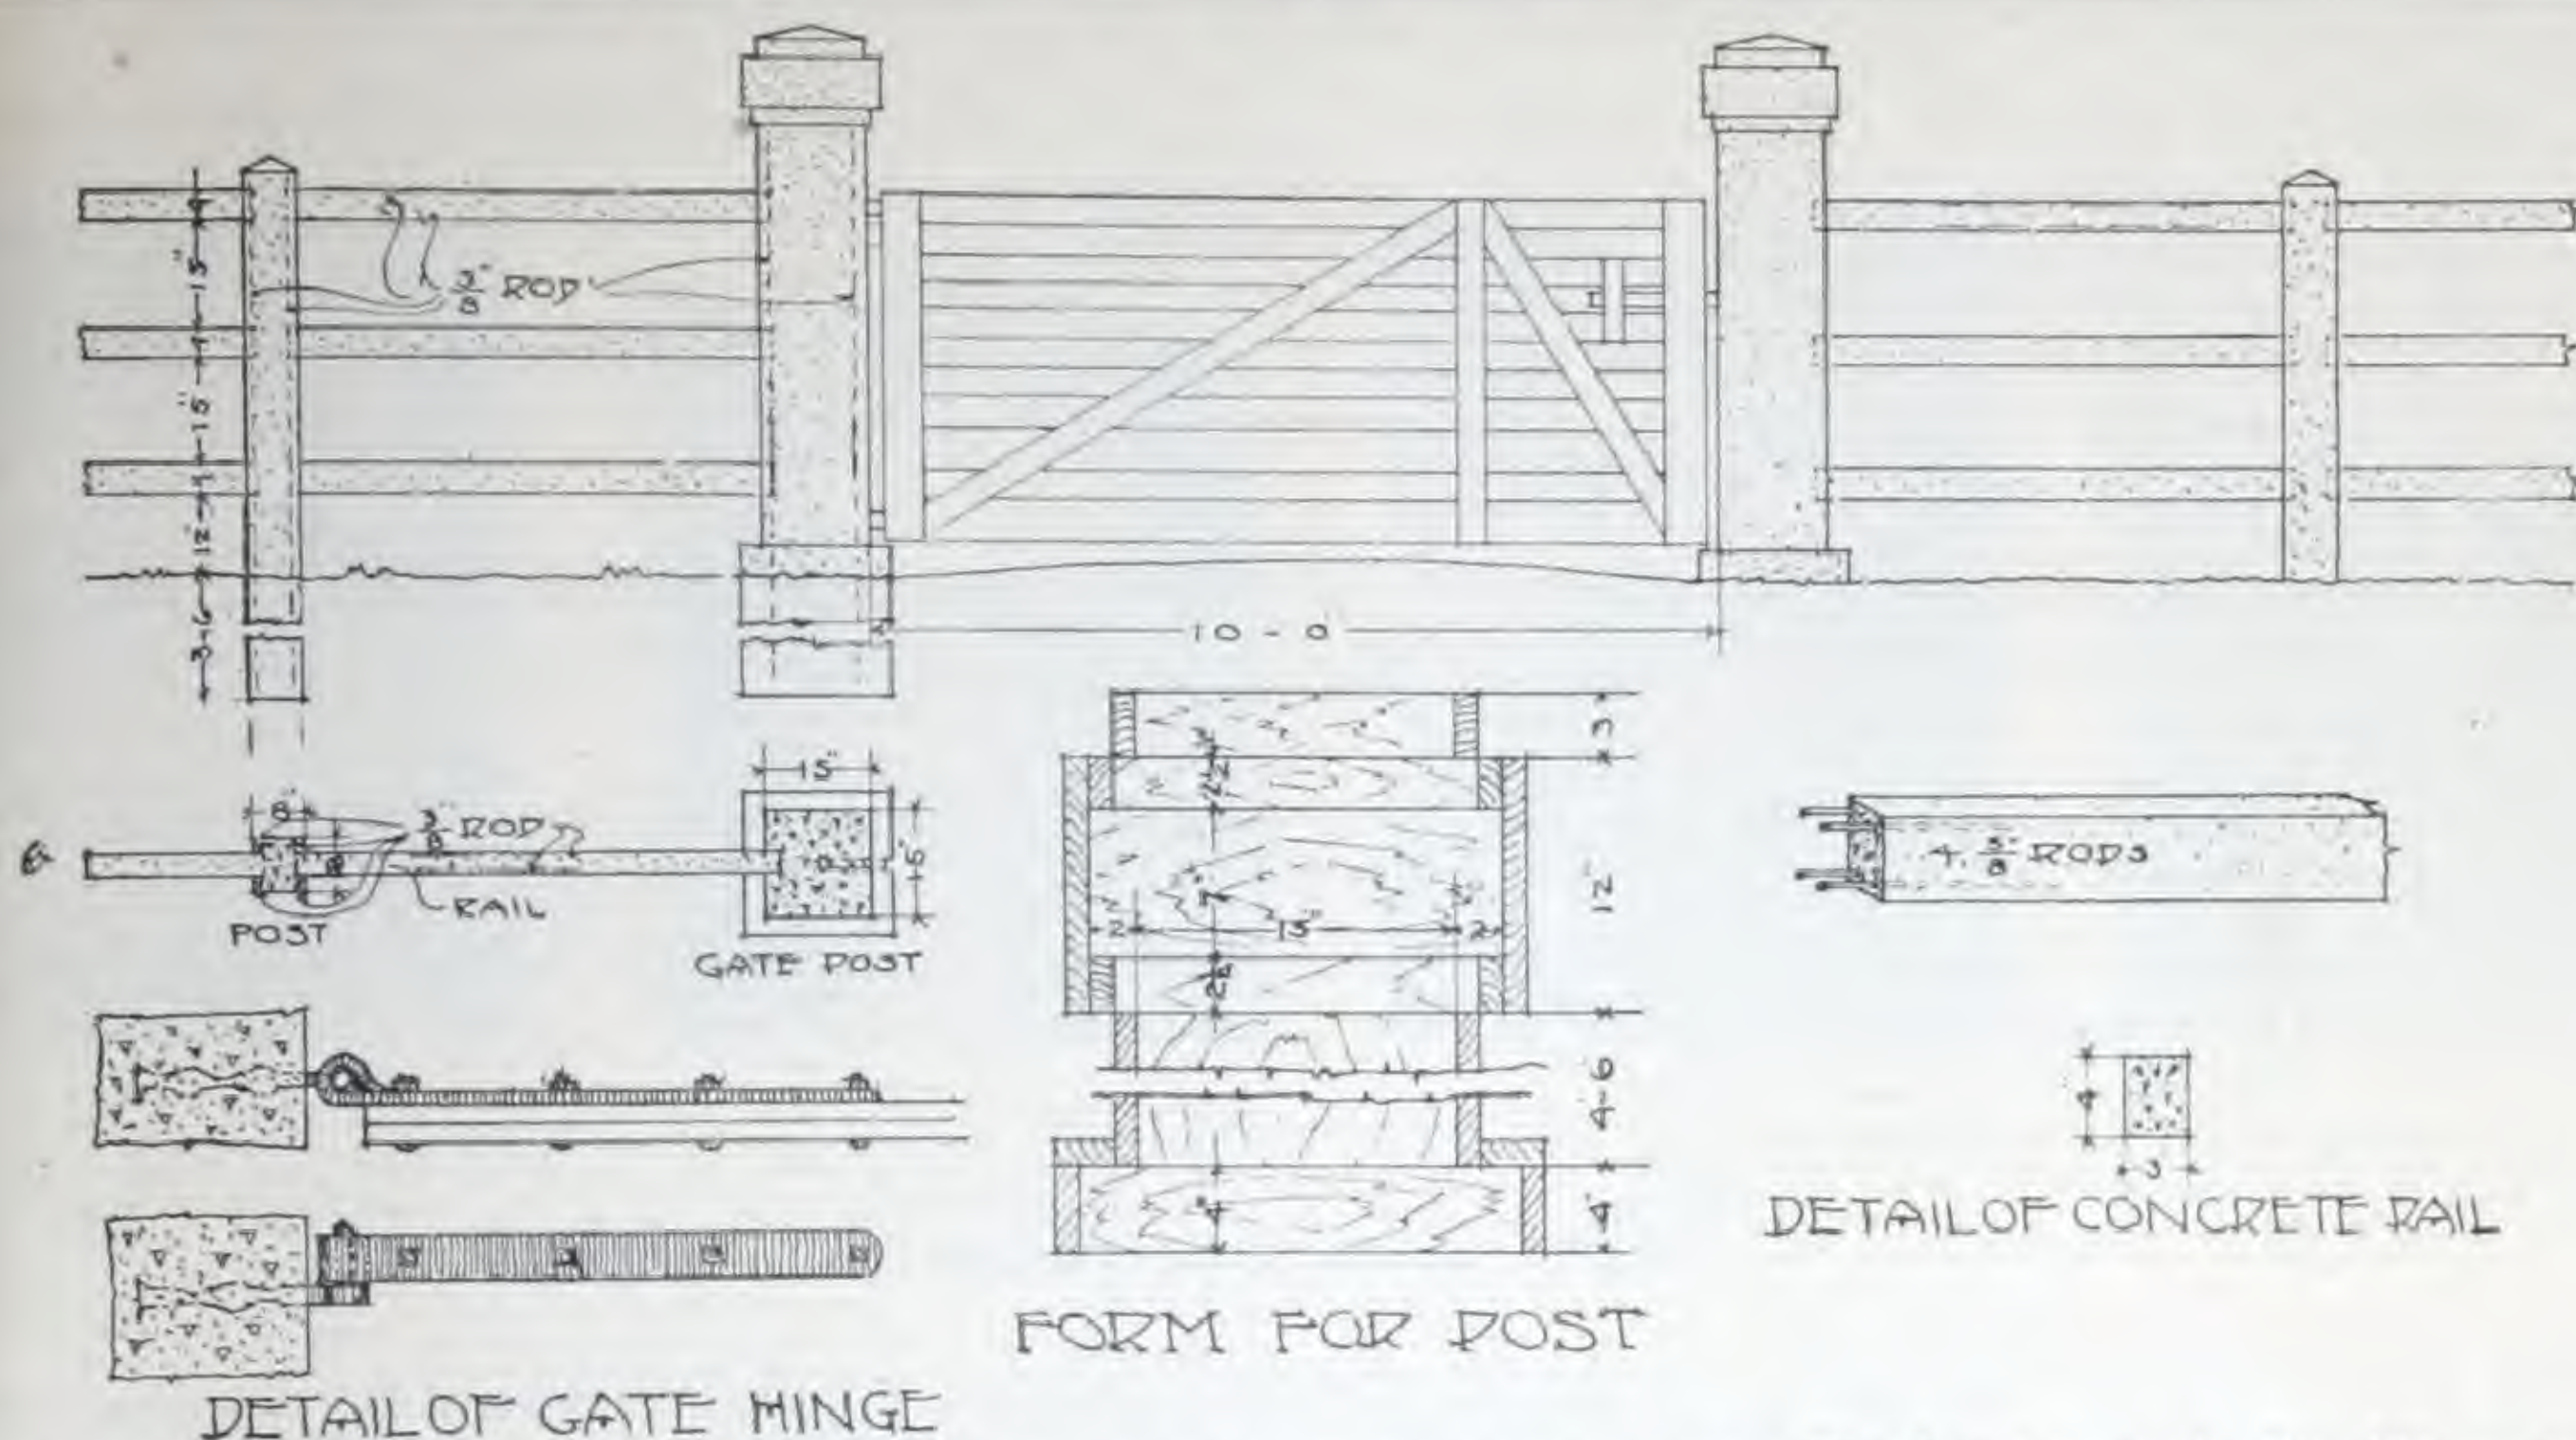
At the top, general construction and reinforcement of gate posts. The bracing, as in Fig. 156 on page 73, and one way of anchoring a gate hinge—see also Fig. 146. In the center the form for the posts. To the right, the reinforcement and the dimensions of a concrete rail.
